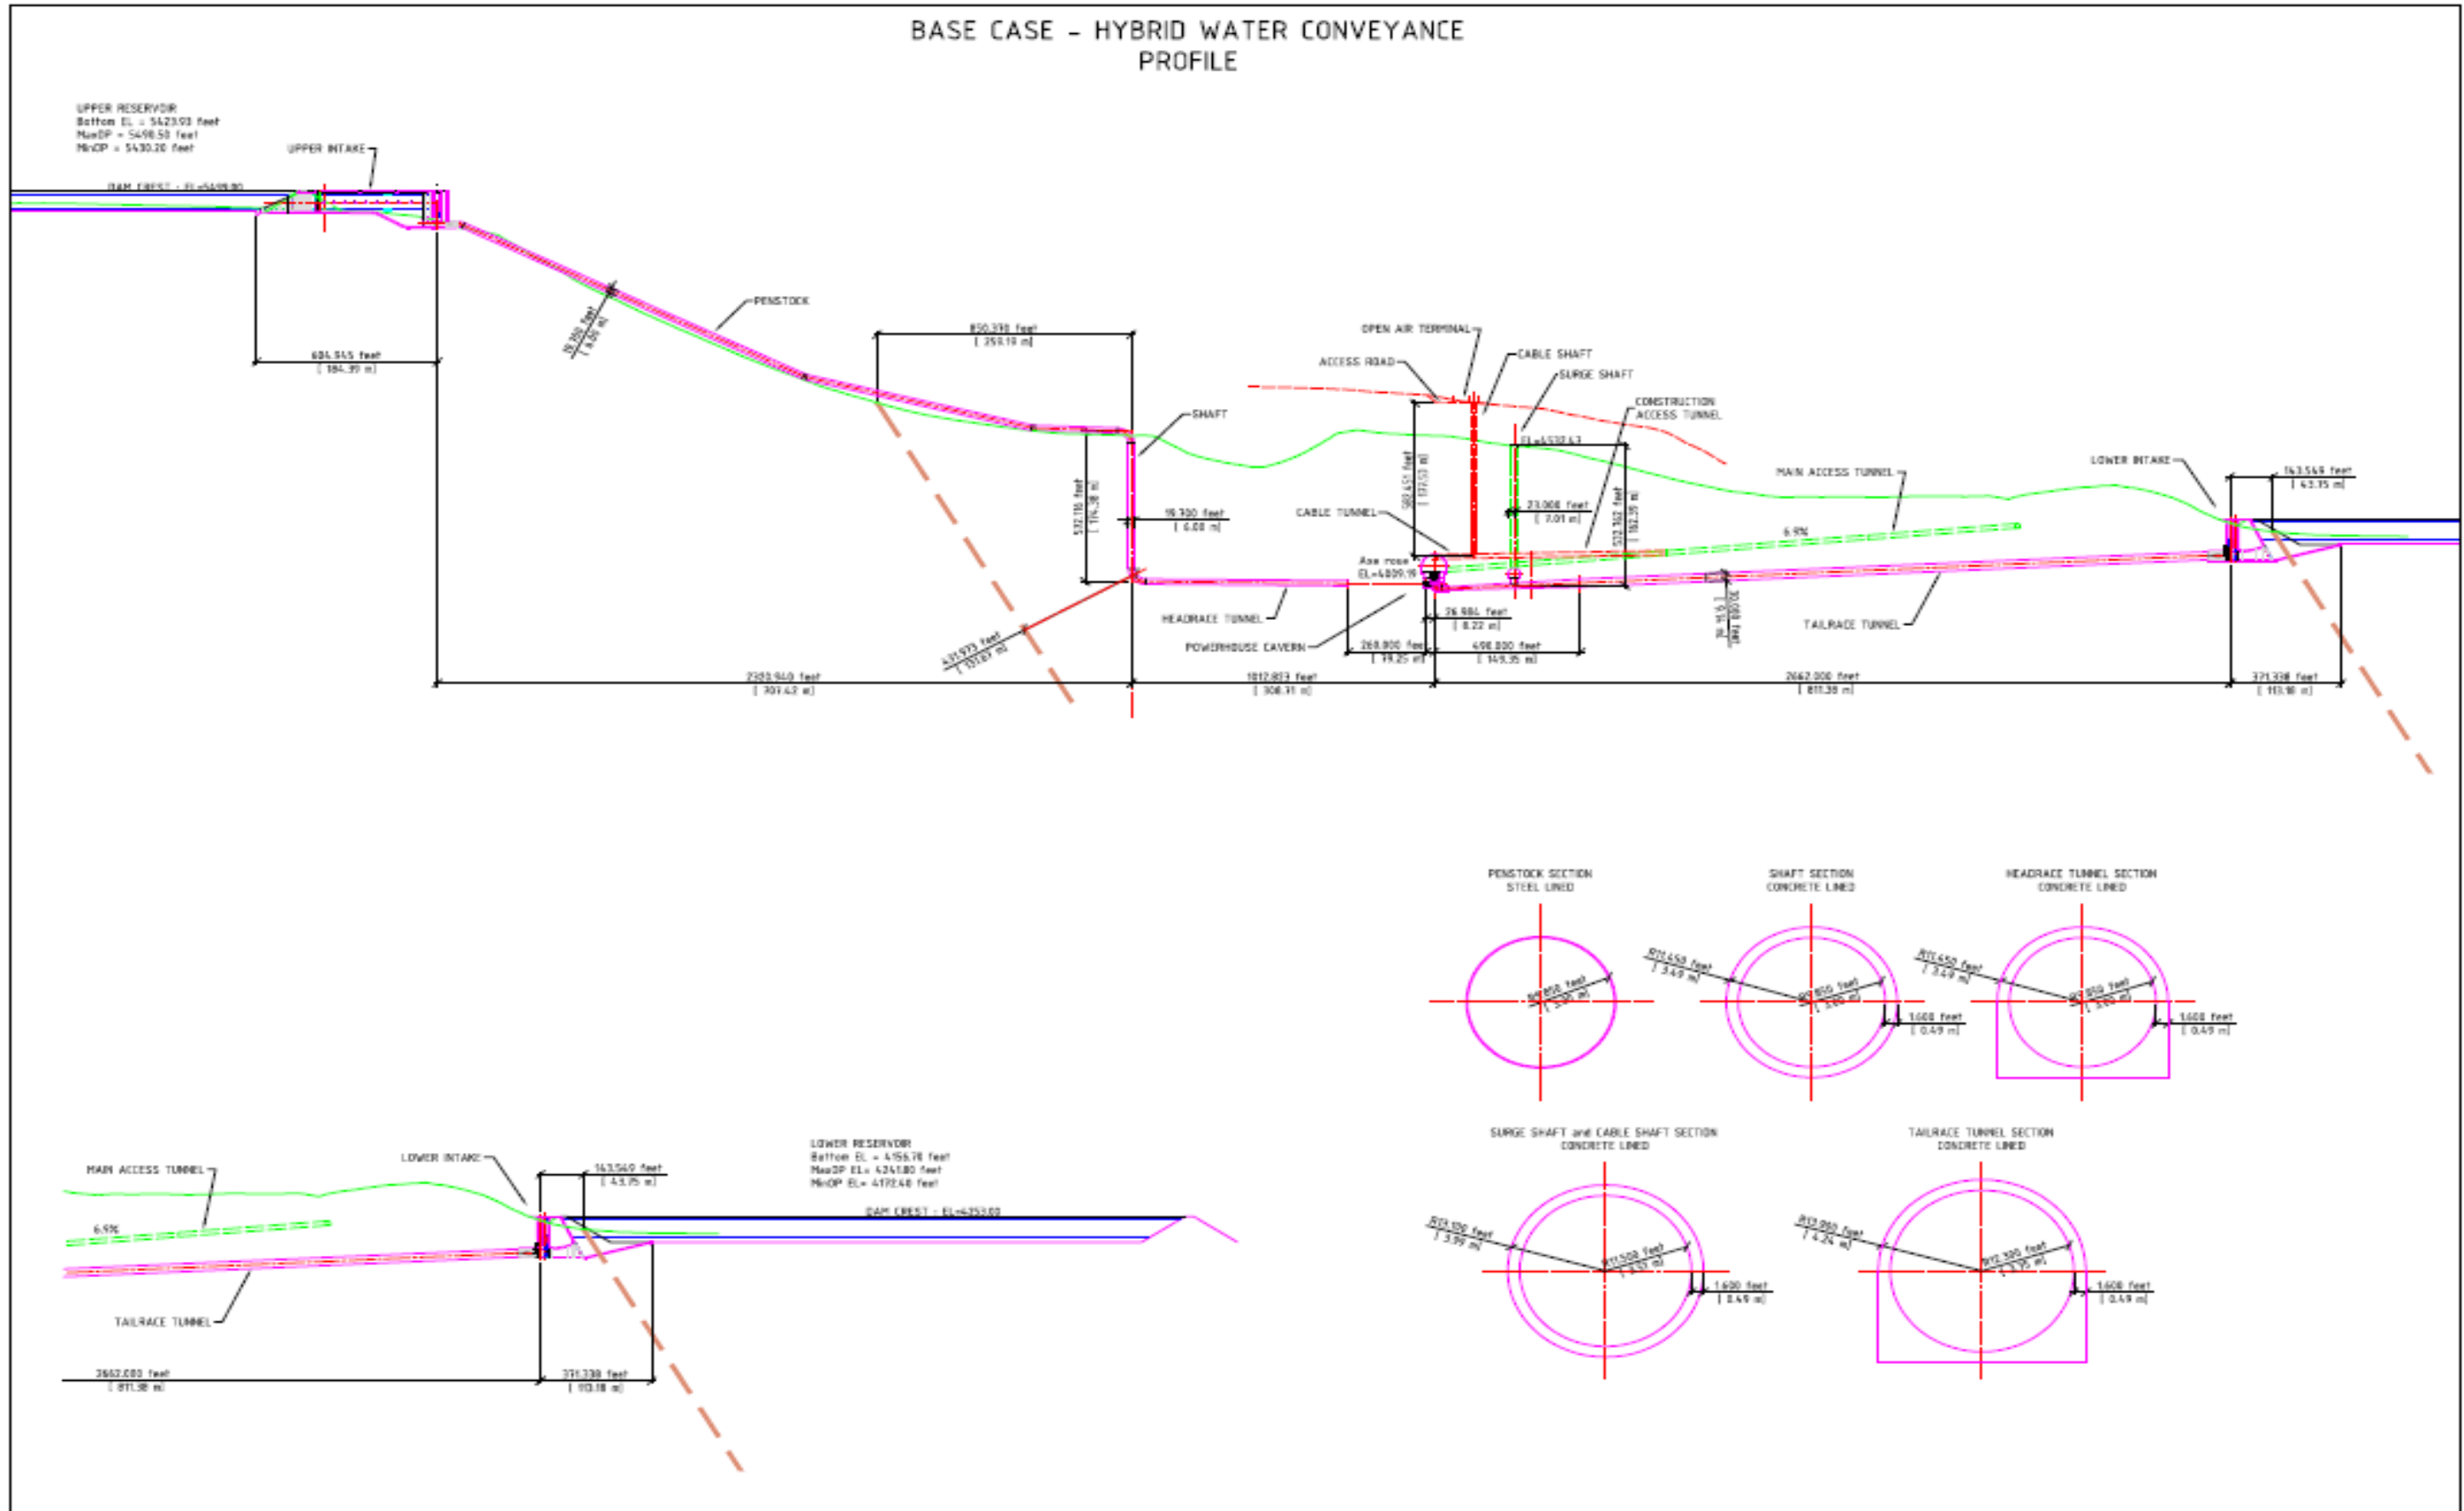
Swan Lake North Site Layout and Profile (Swan Lake North Pre-Application Document)
